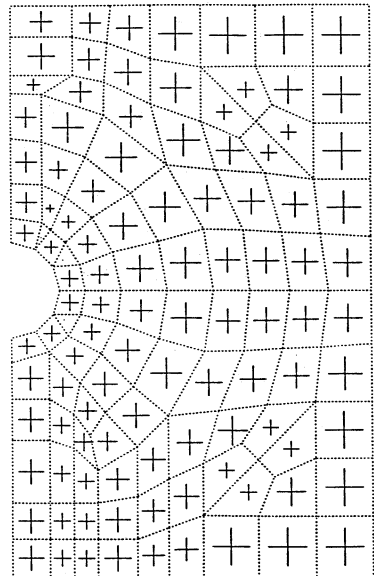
Assumed Layout of Reinforcing Steel in the Steam Generator Compartment Floor of a VVER-440 Model V213
